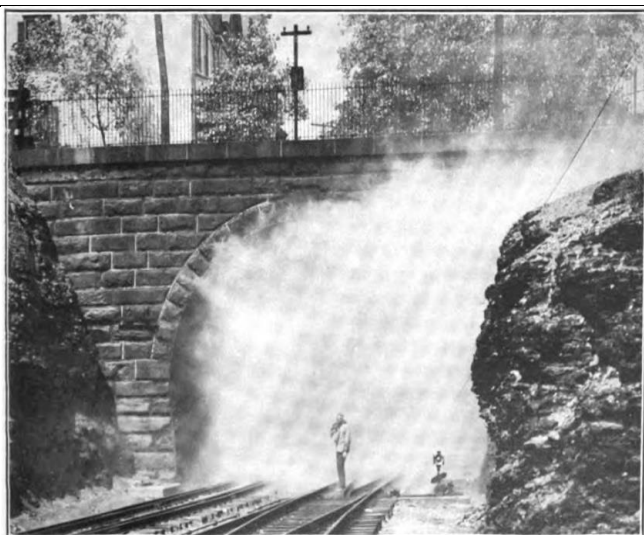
Unventilated Railroad Tunnel after Train Passage.
